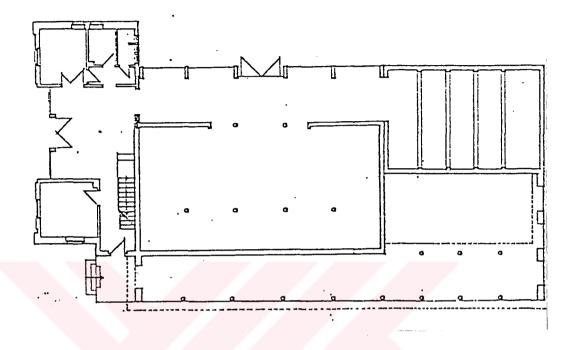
The prototype plan used in Turkey in the 1960's. Ground floor plan.
